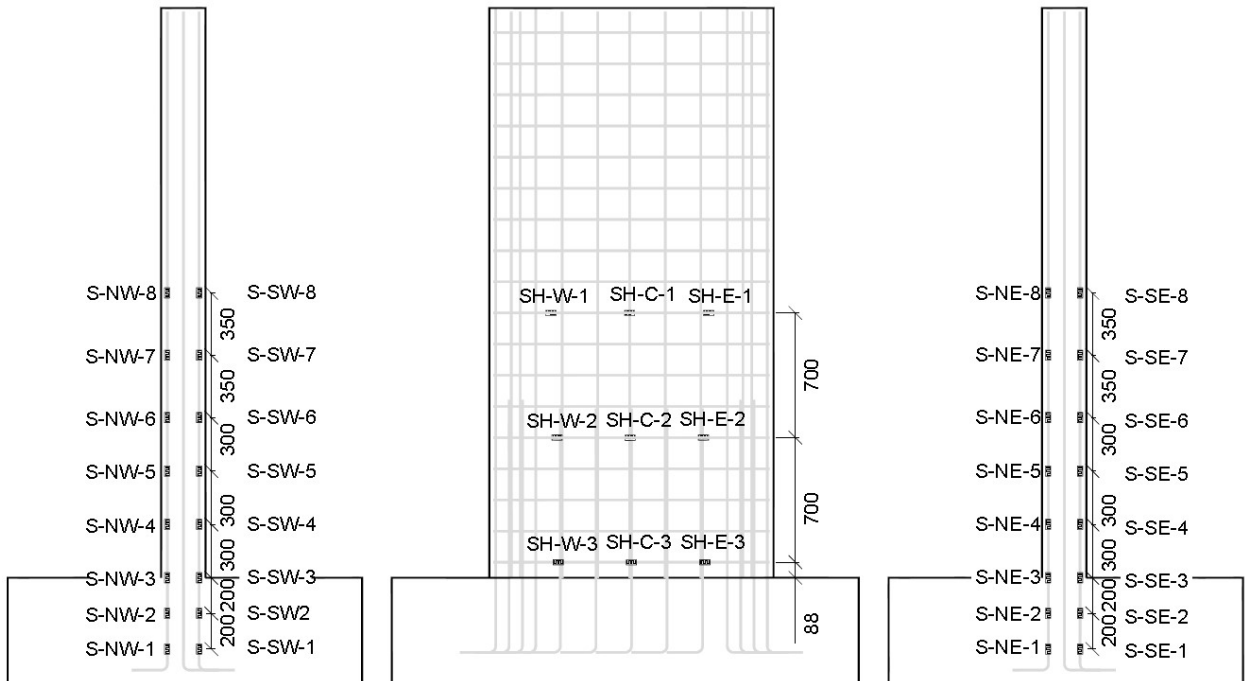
Wall W2HS strain gauge instrumentation plan
